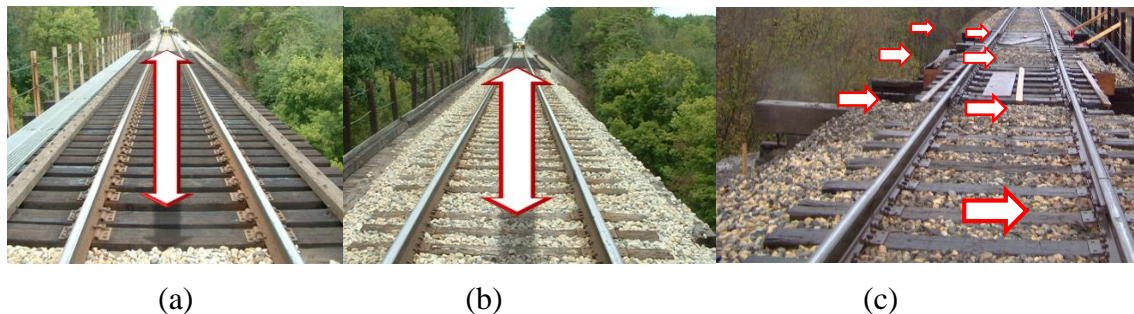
Bridge at track level: (a) new open deck track at main span, (b) ballasted deck at South approach, and (c) jointed track detail in trestle approach.
